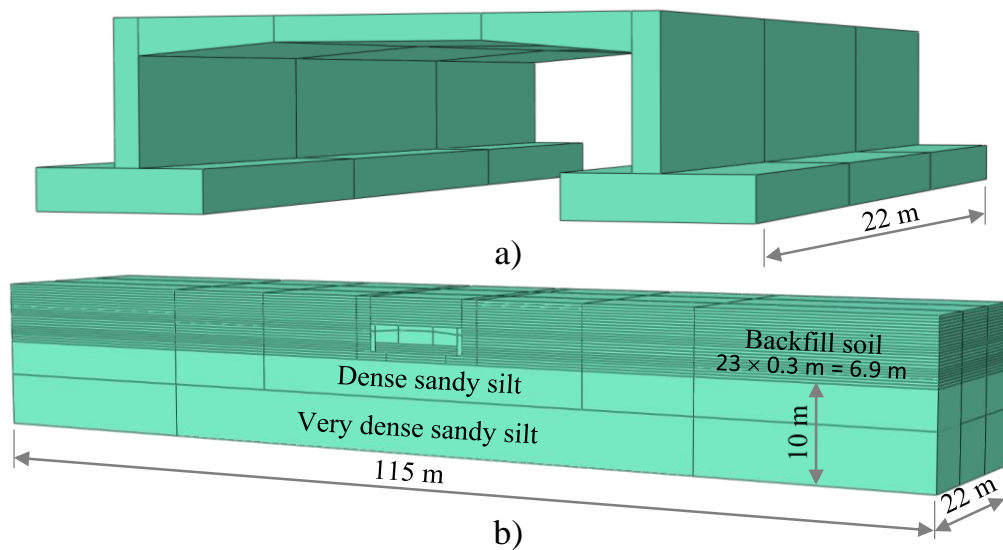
Schematic of the Pickering culvert model parts: a) culvert part; and b) soil block part.
